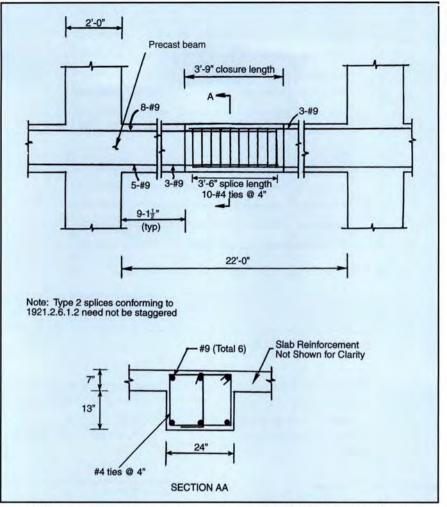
Beam-to-beam wet connection near midspan of third-floor beam forming part of interior longitudinal frame.
